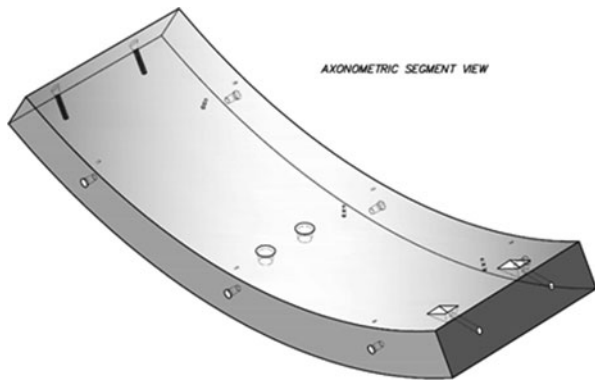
Tunnel lined with precast segments; notice the slots for longitudinal and transversal bolts. (By Pizzarotti)
